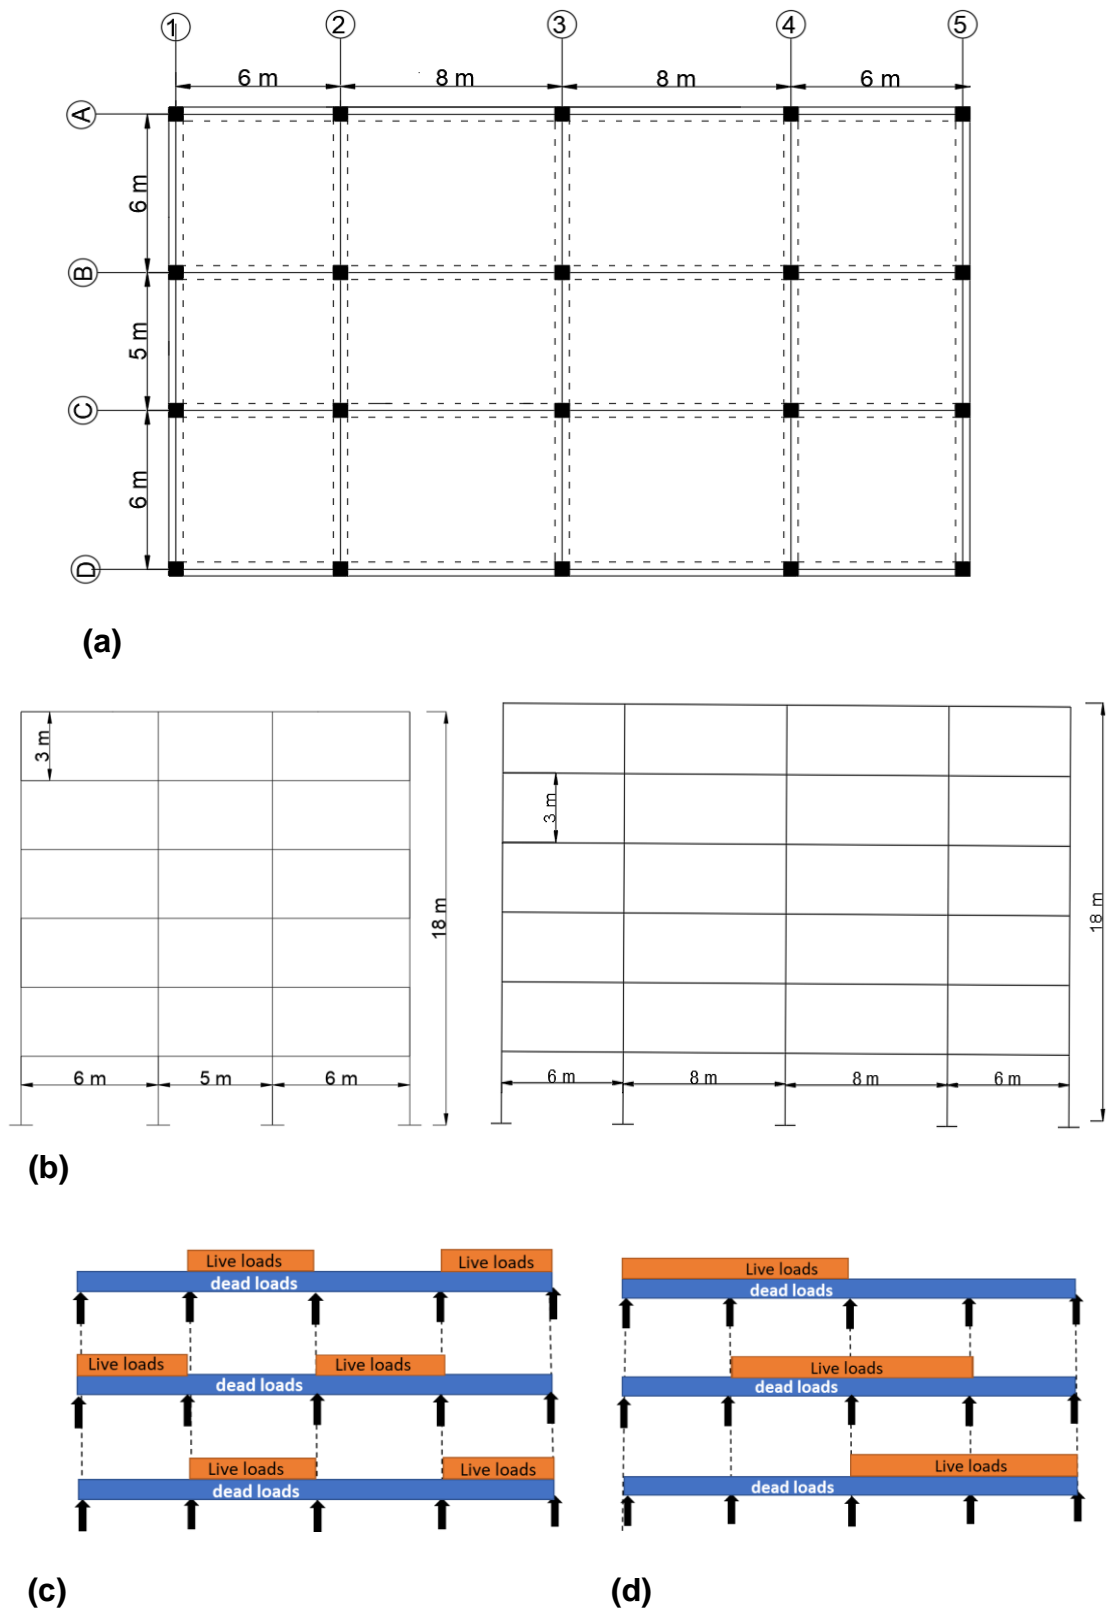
(a) Plan details of the frame model (b) Side and front views for the frame model (c) Gravity Loads arrangement-type 1 (d) Gravity Loads arrangement-type 2
